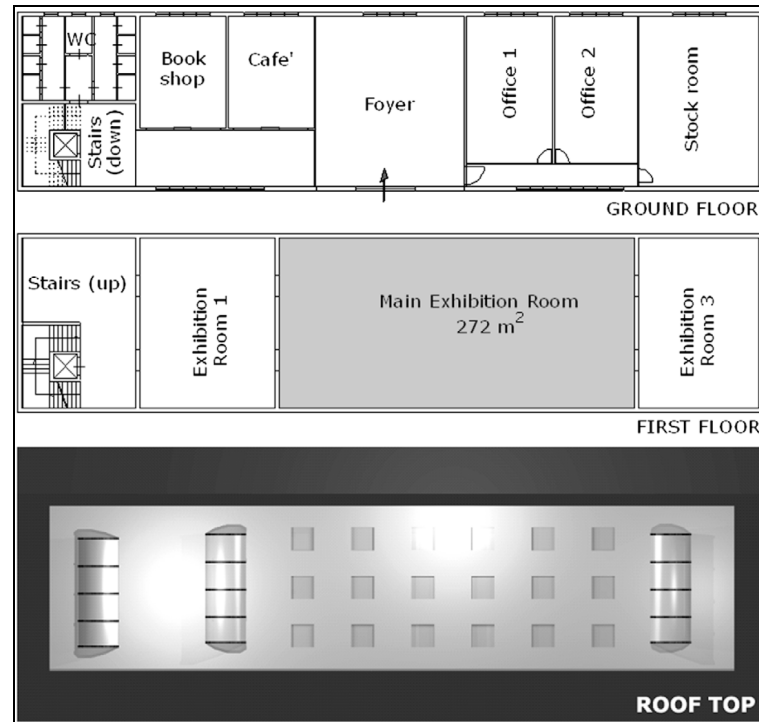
Plans of the ground floor, the first floor and the roof top with the skylights
